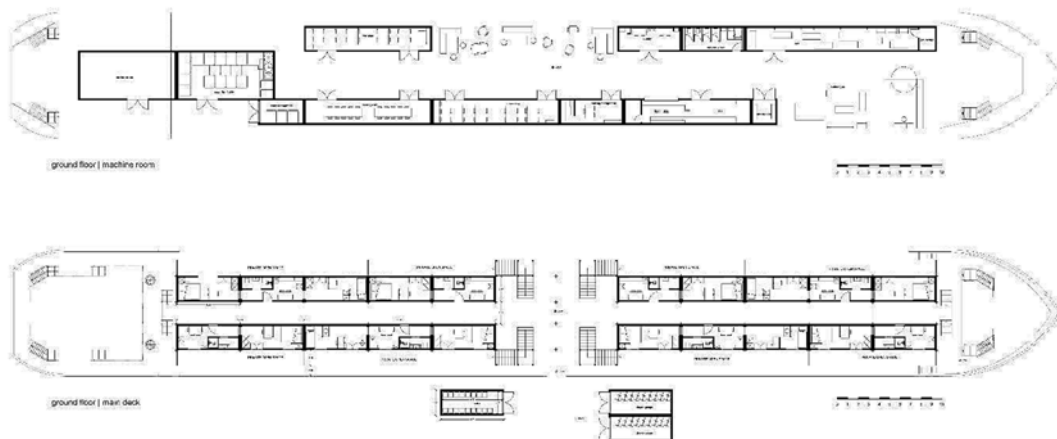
Binnen bleiben – Lower and ground floor deck plan<sup>77</sup>
